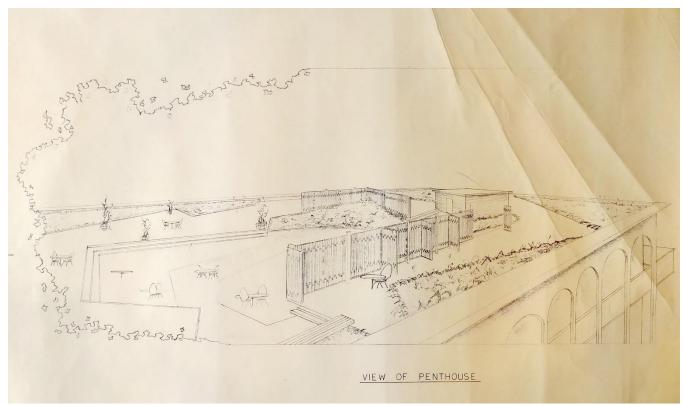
Original perspective drawing of the Cambridge Tower roof top garden area from the 1964 construction drawing set. Source: Austin History Center, Architecture Collection.
